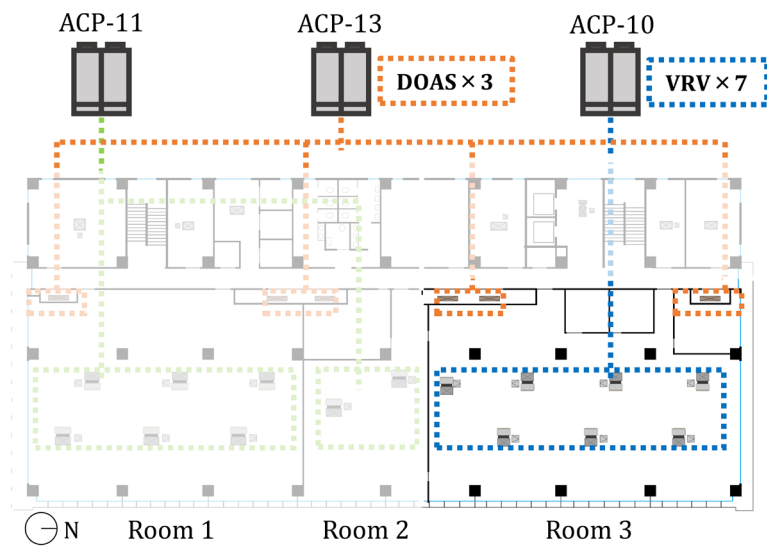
Layout of the third floor with the installed HVAC systems.
